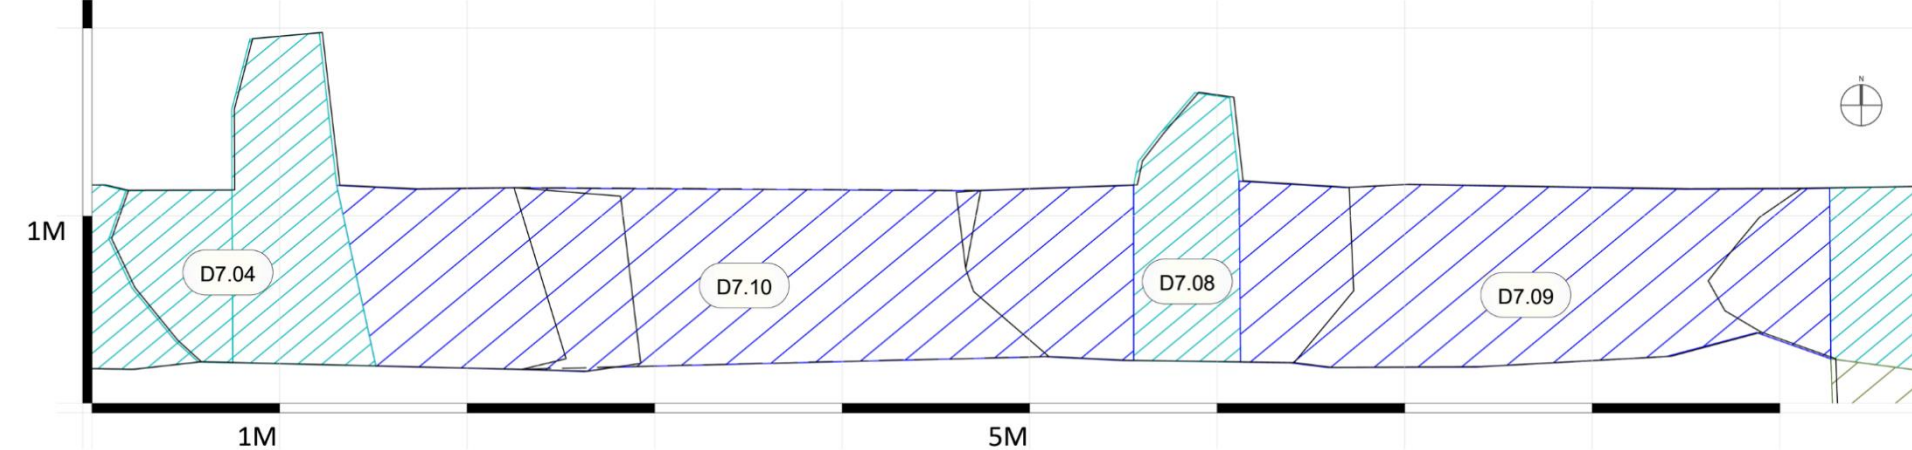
Works undertaken to the south elevation of the south nave wall (scale 1:40)
